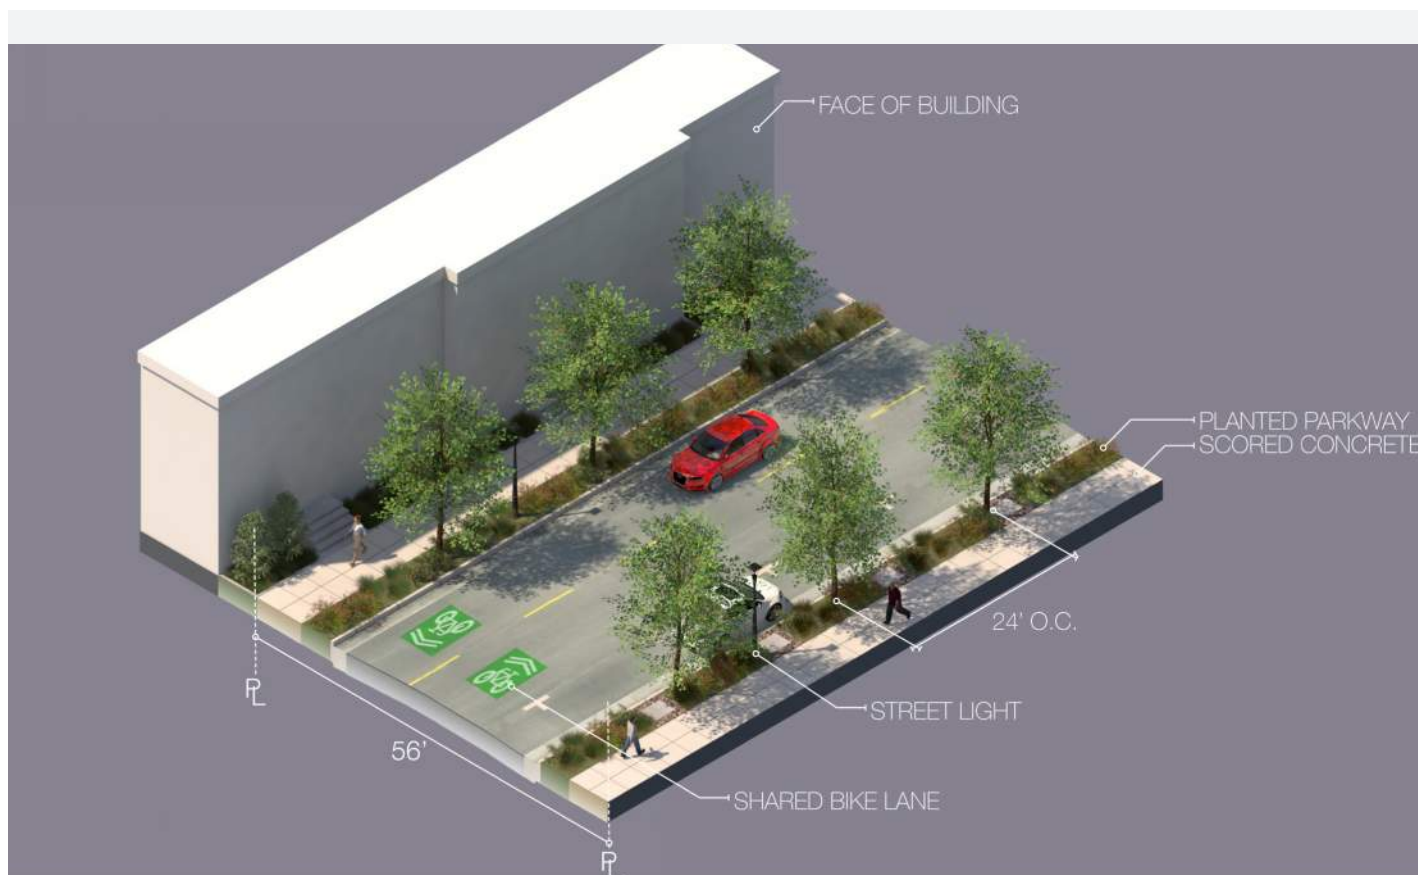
Street Axon – Altair Vista – Planted Parkways
